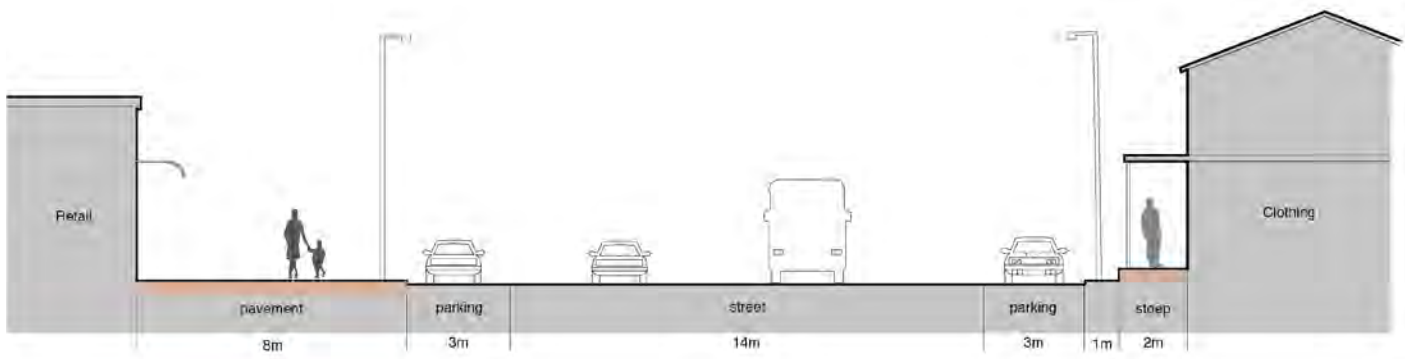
Voortrekker Street Commercial Core - Existing Cross Section
